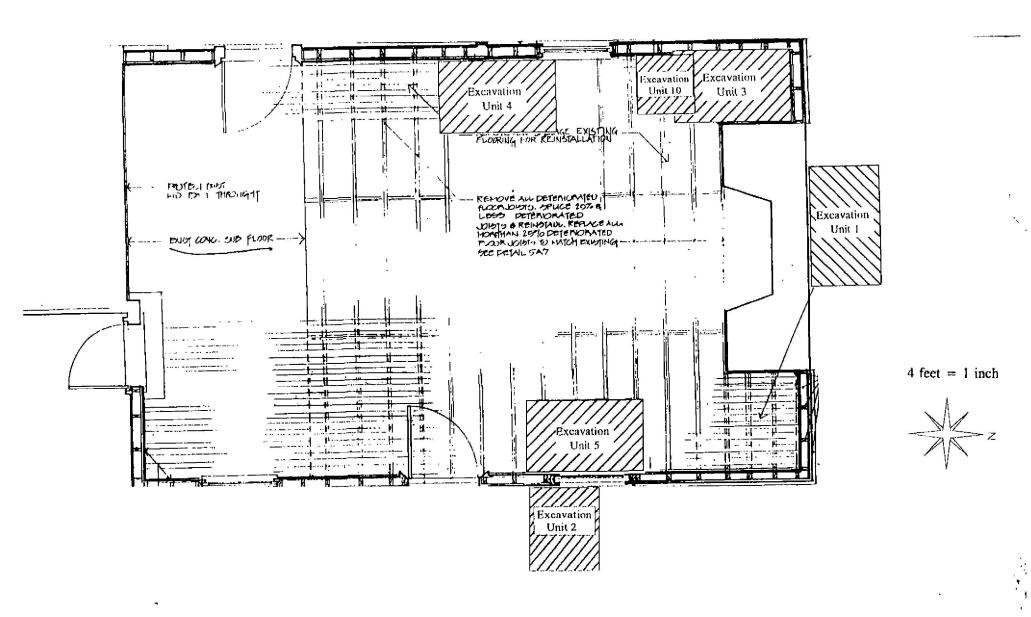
Excavation units in and around the summer kitchen section of the King Manor house.
